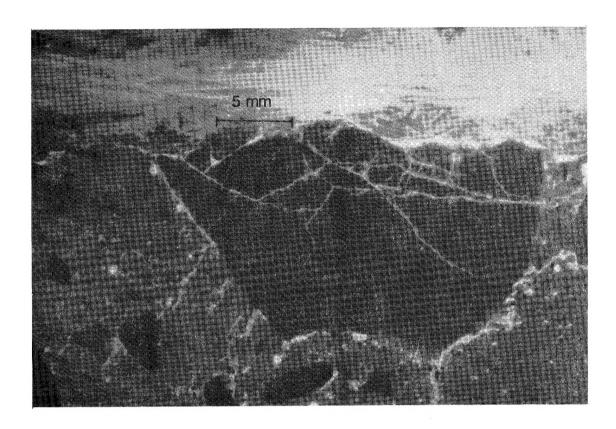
Specimen 940008. The concrete is made with limestone coarse aggregate. The cross-sectional view of the surface shows a fractured coarse aggregate particle. The fracture density is highest near the surface and declines deeper in the concrete. Fractures extend from the aggregate into the paste in many instances. 4X
